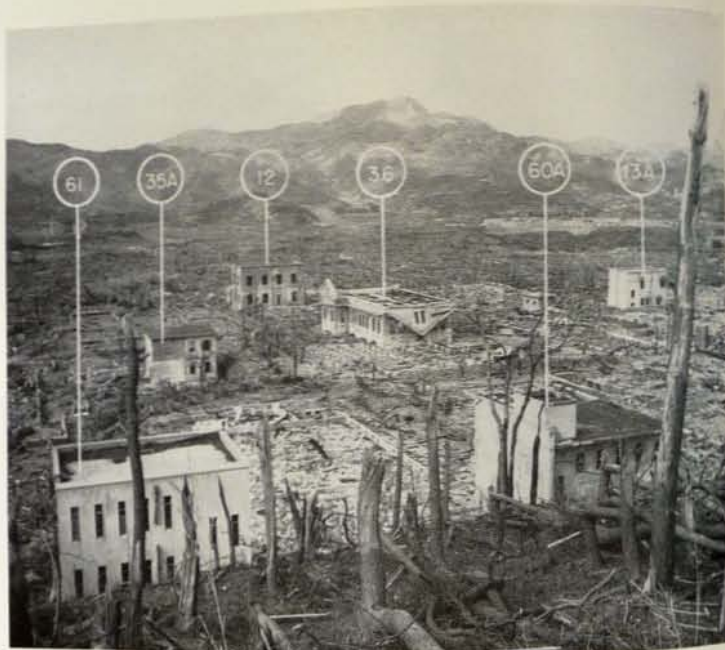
1,500 feet from GZ. Group 17, general view of remaining buildings at Medical College.
